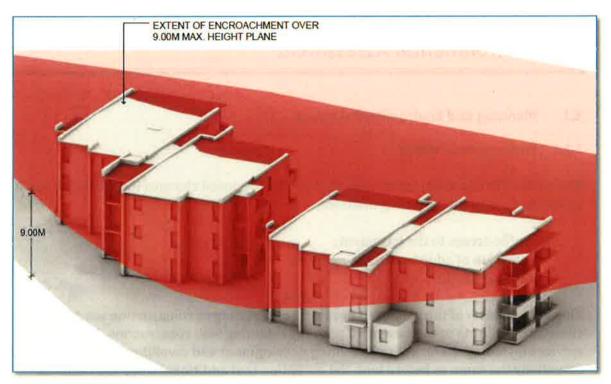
Building height plan section through Buildings A and B – original position of buildings
